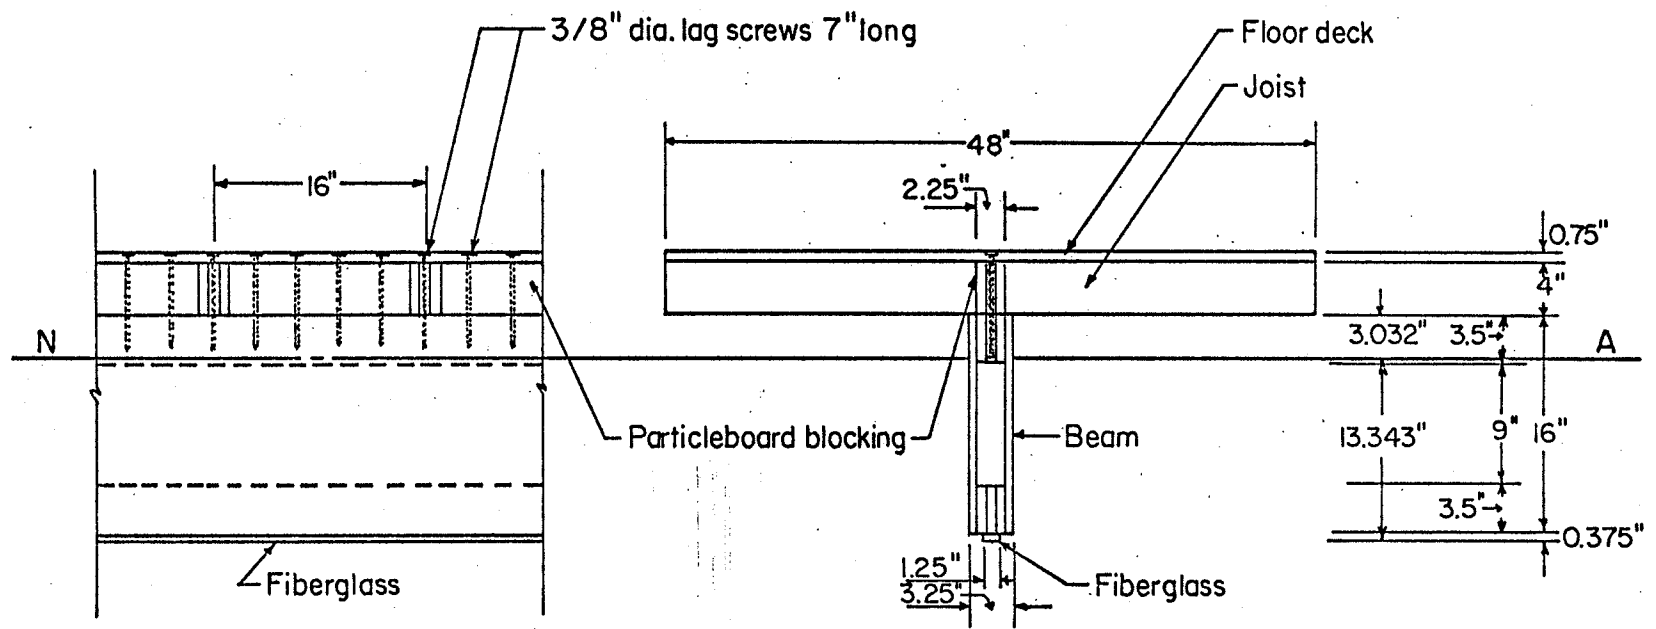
Details of End Section of Test Structure from Load Point to Support.
